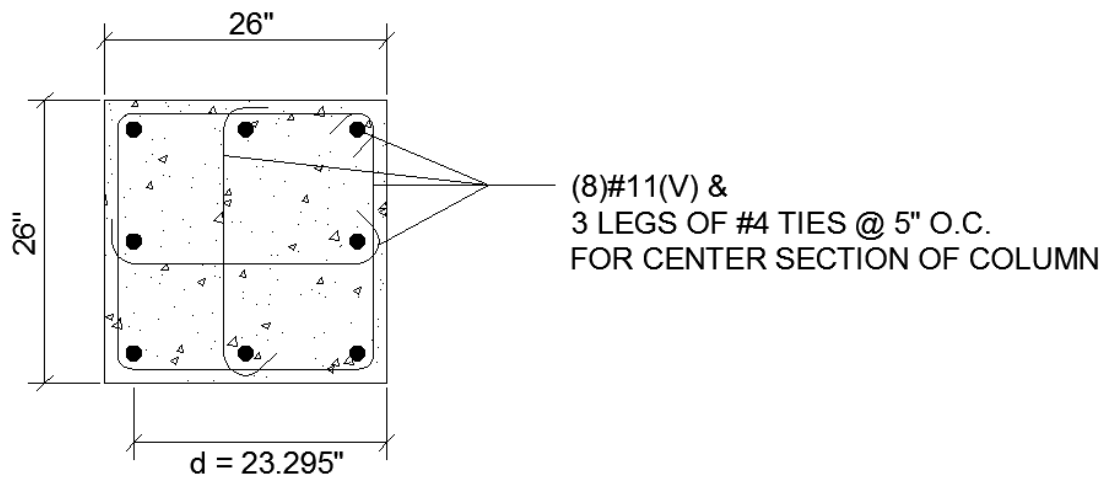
Exterior column, cross-section at center of column at ground floor level based on tsunami design requirements.
